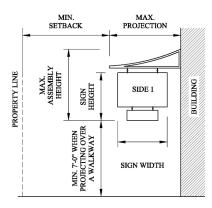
One-sided and Two-sided Signs on a Building
